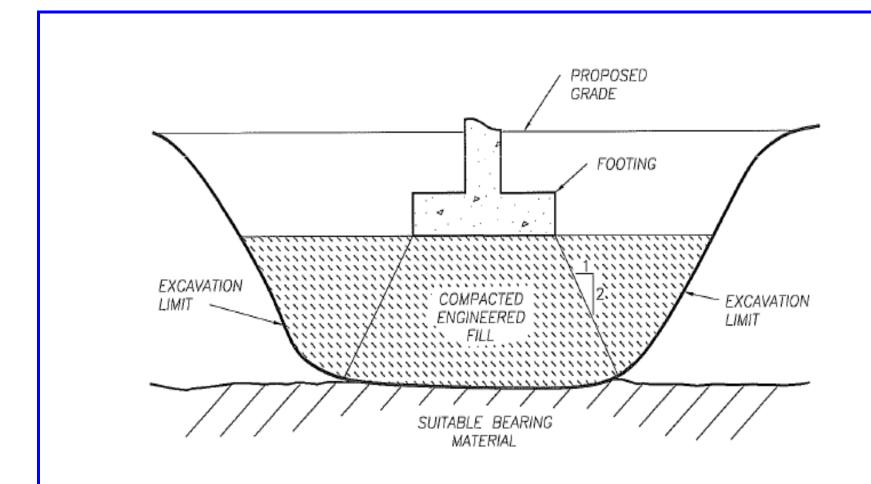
DESIGN ILLUSTRATION FOOTINGS IN UNDERCUT AREA
